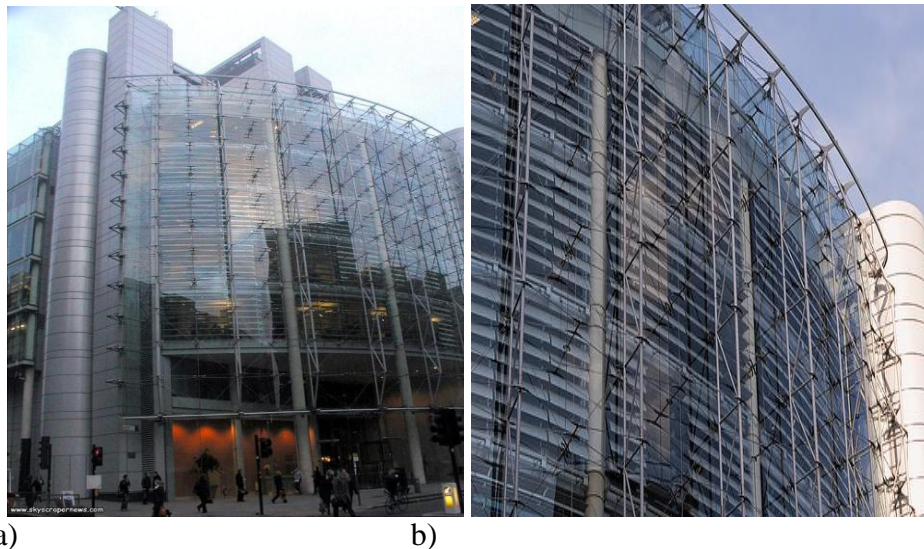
View of Helicon Building, in London; in 1997; Architect Sheppard Robson International. a) View of the facade (URL 53); b) detail of the facade with louvers located in cavity (URL 54). The building has a triple glazed facade that integrated adjustable shading devices allowance for maximum transparency while minimizing heat gain and providing a temperature buffer in cold weather. Chilled ceiling and floor based air supply are used to increased user comfort while decreasing the long-term energy use of the building (Sharma, n.d: 2-3).
